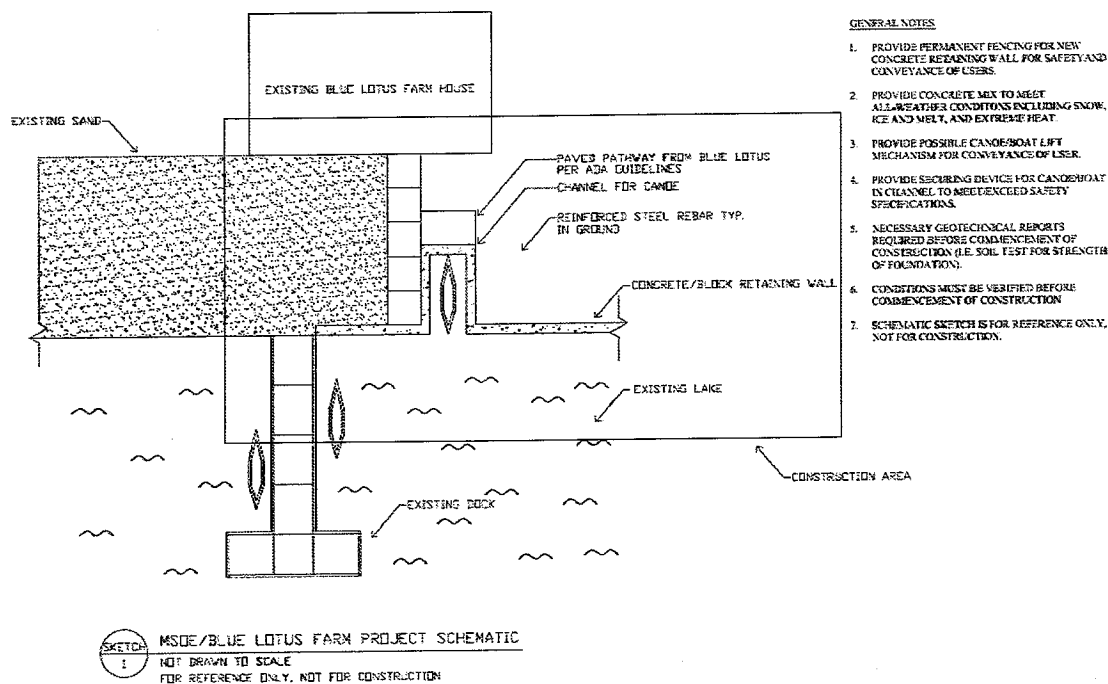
Jeff Chan's design for a retaining wall at Blue Lotus
